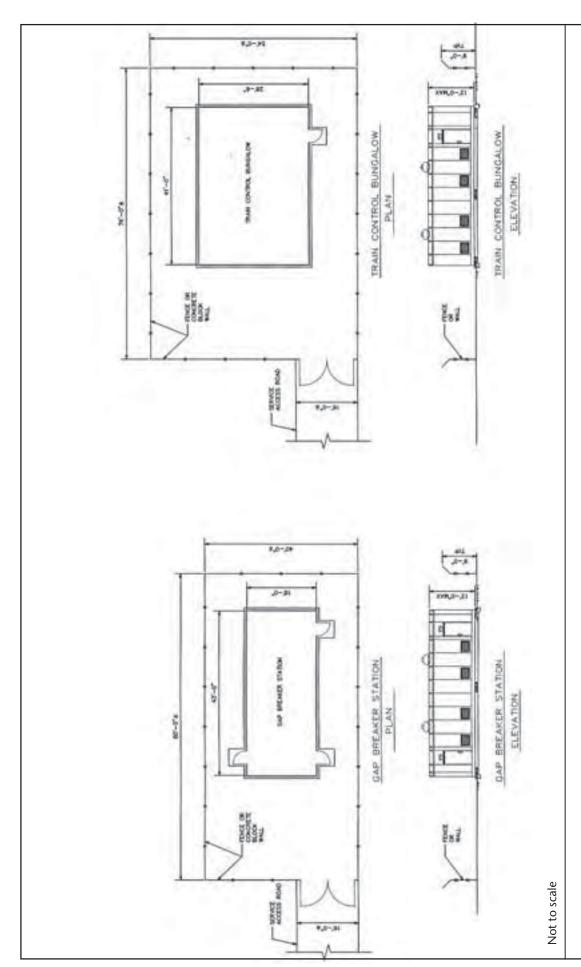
Proposed Wayside Facilities Typical Layouts
